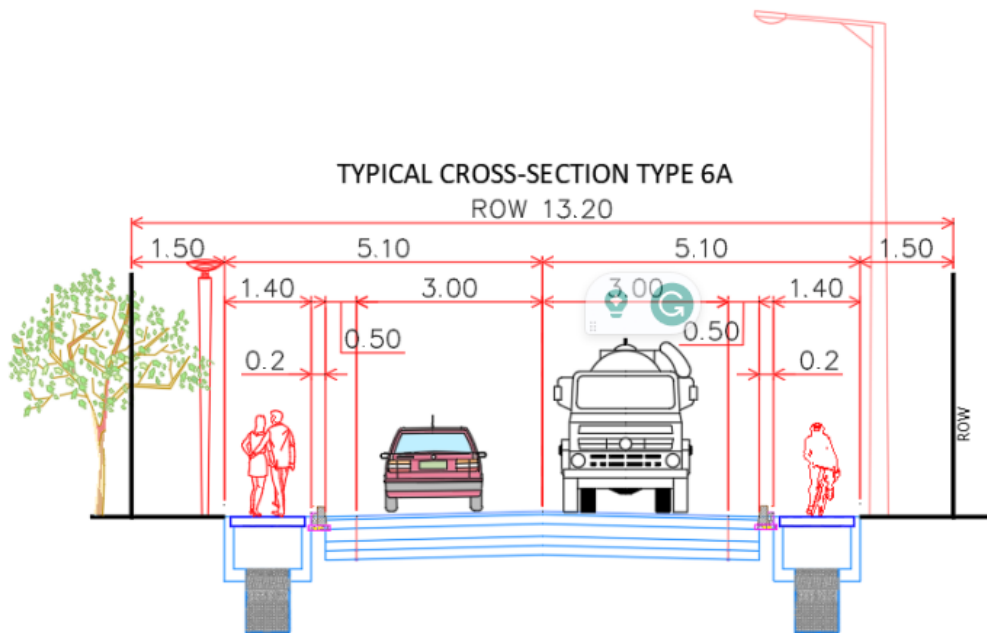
Typical cross sections Type 6A for Collector roads (Urban Area)
